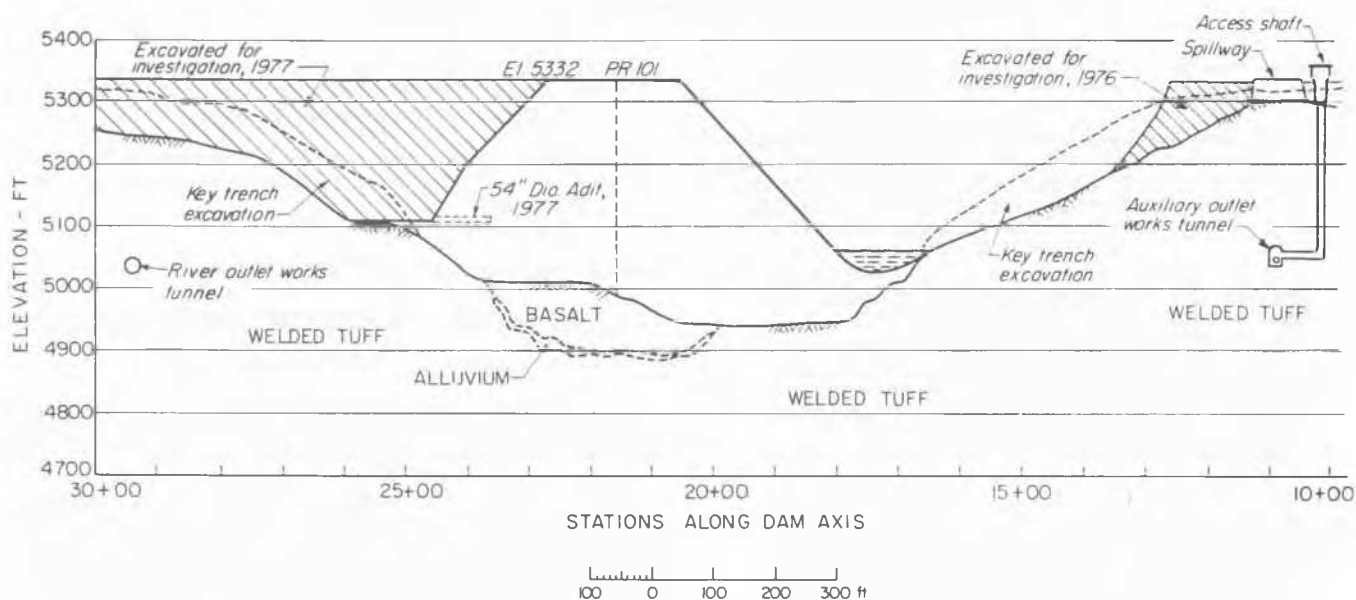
Excavation of Embankment on Left Abutment in 1977
